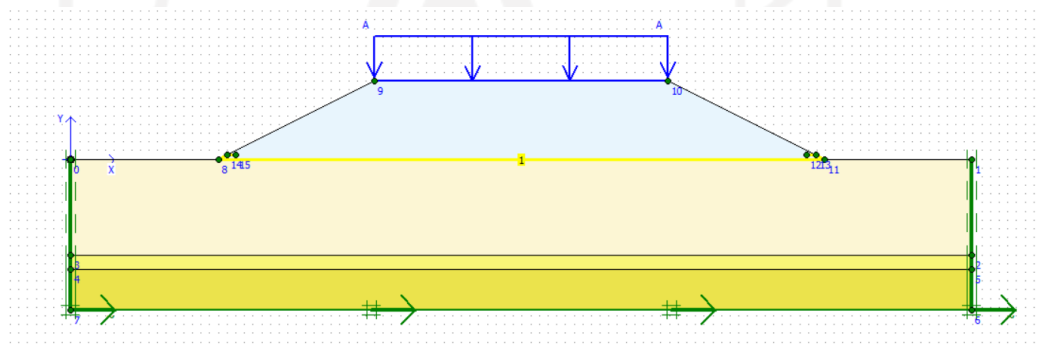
Existing Embankment with Geotextile Reinforcement
